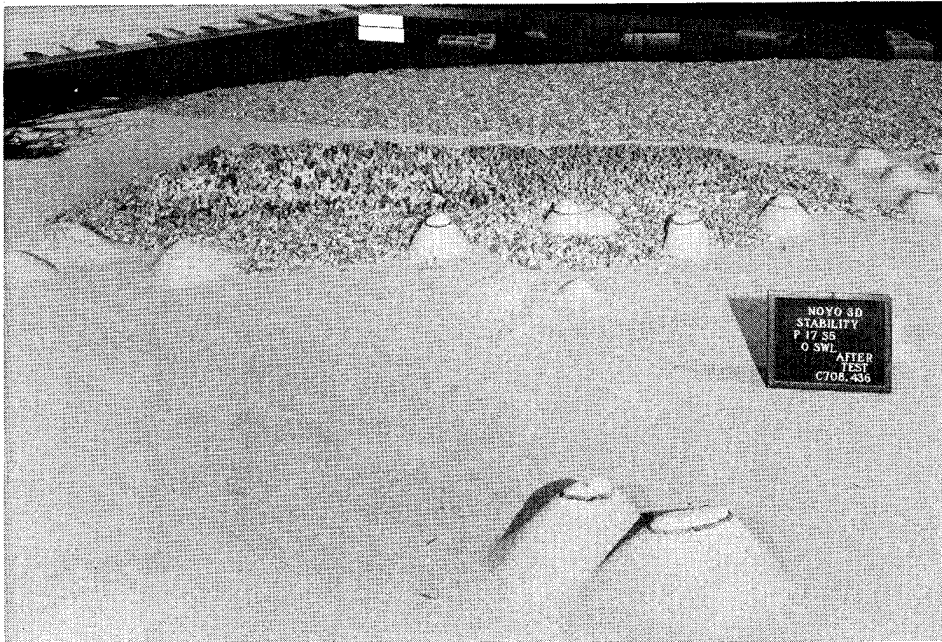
Sea-side view of Plan 17 after five series of modified Storm IB waves at +0 m mllw
